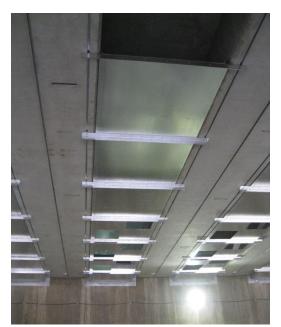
Unistrut inserts on box girders, formed ventilation ducts can be seen between girders.
